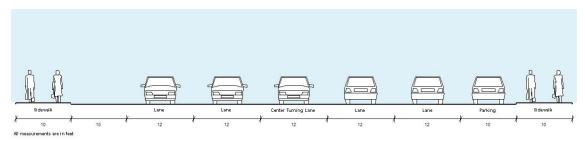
Section Drawing of US 290 in Downtown Giddings (Source: Texas A&M Transportation Institute).
